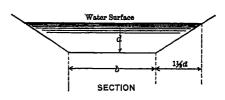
(Part 1 of 3) —Hydraulic Elements of Trapezoidal Sections.
